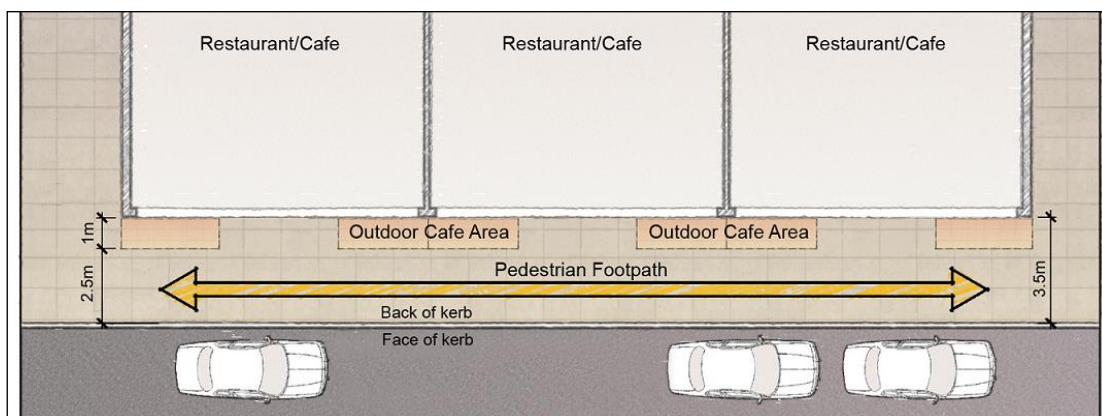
Placement of outdoor seating areas cannot interfere with pedestrian road access
